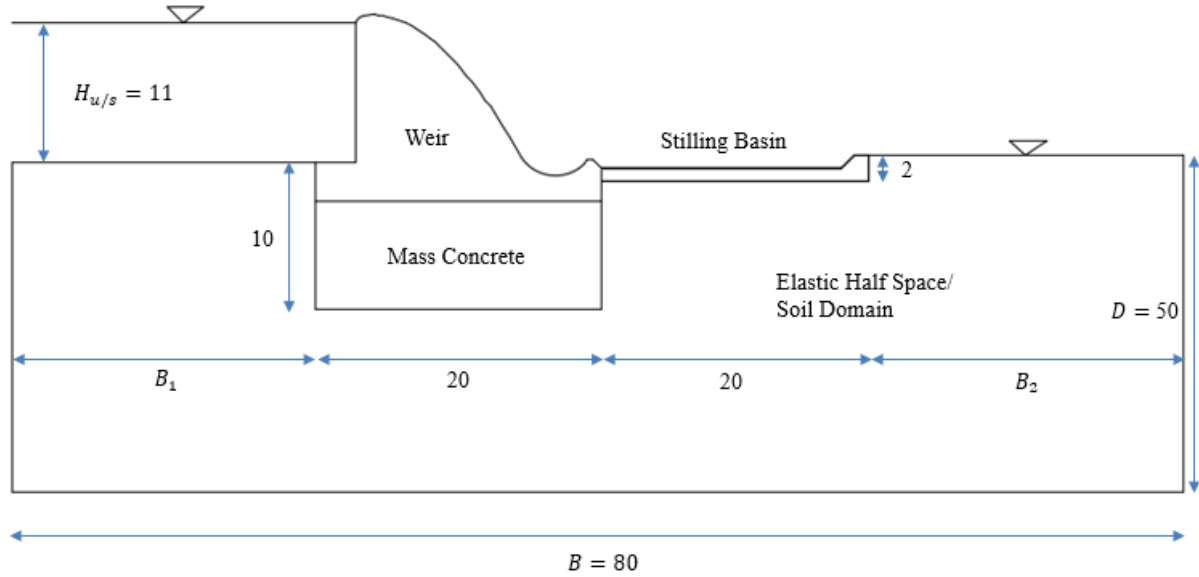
Geometry and Dimensions (m) of the Weir structure foundation
